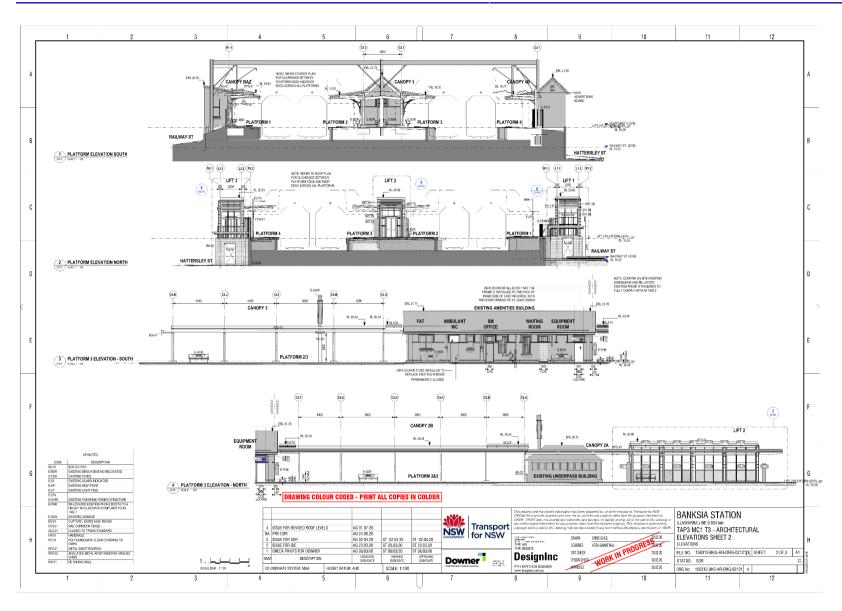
Banksia Station architectural elevations – Sheet 2
